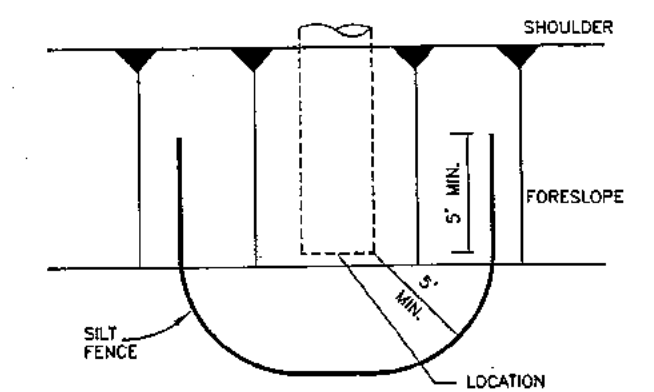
DETAILS OF BARNROOF FORESLOPE AT DRAINAGE STRUCTURE
